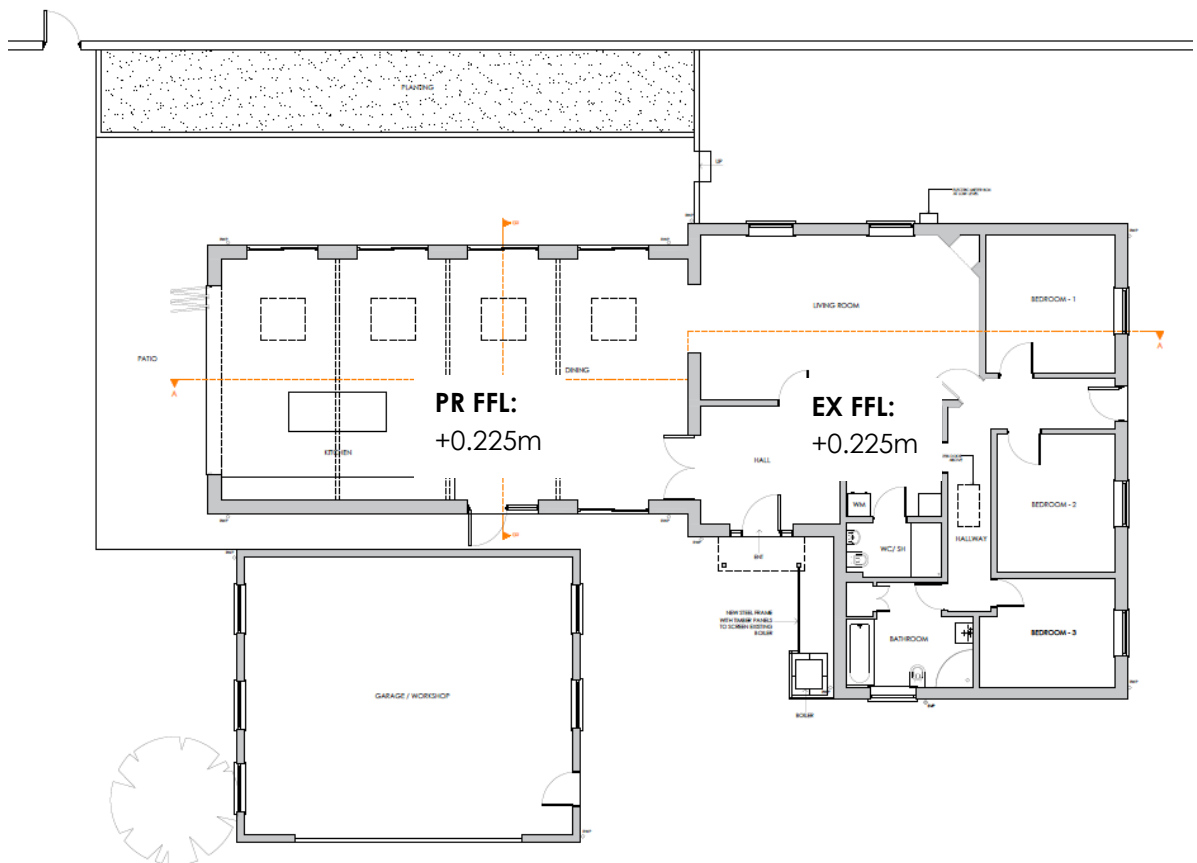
A Floor Plan illustrating the estimated existing and proposed height levels taken from the site.
